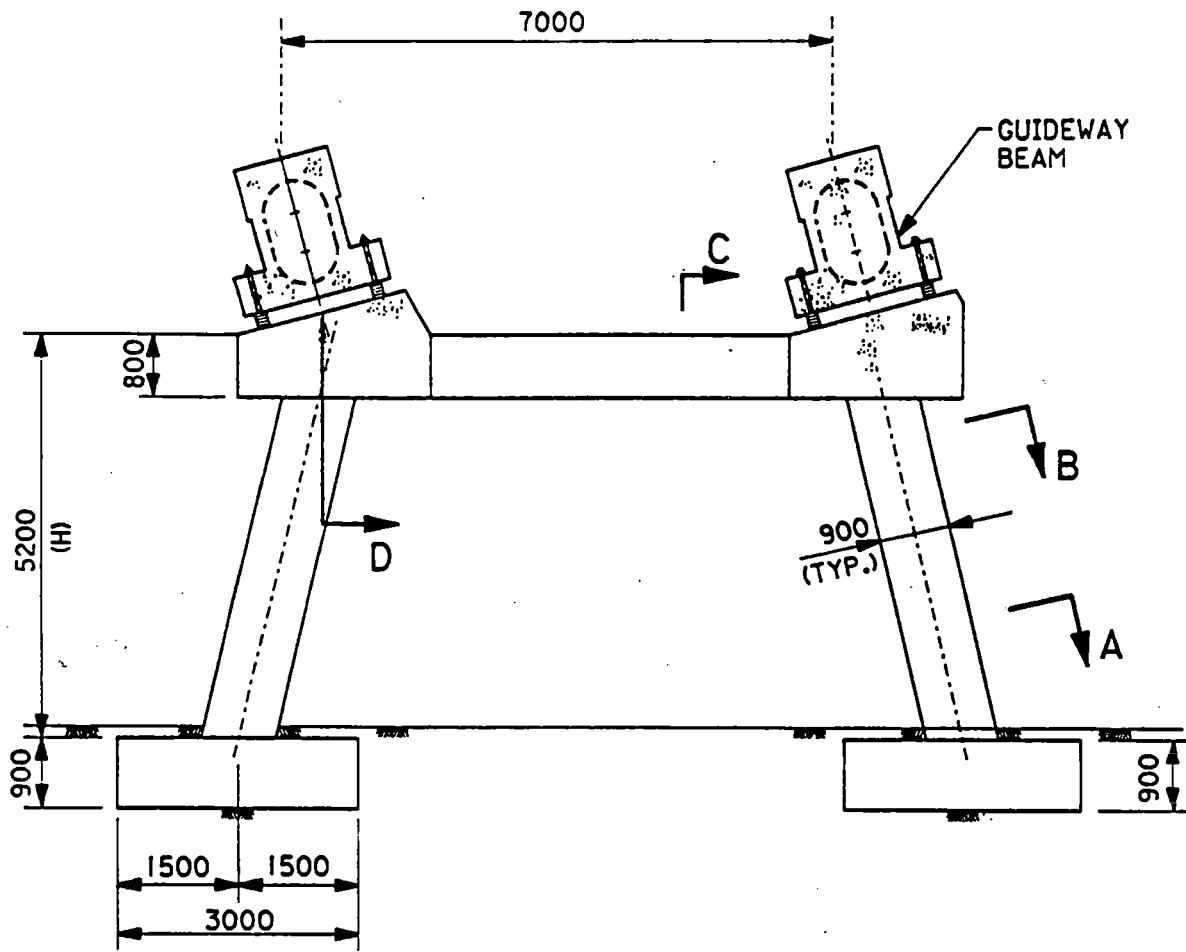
Frame elevation for dual curved track guideway with 25 m span with sections
